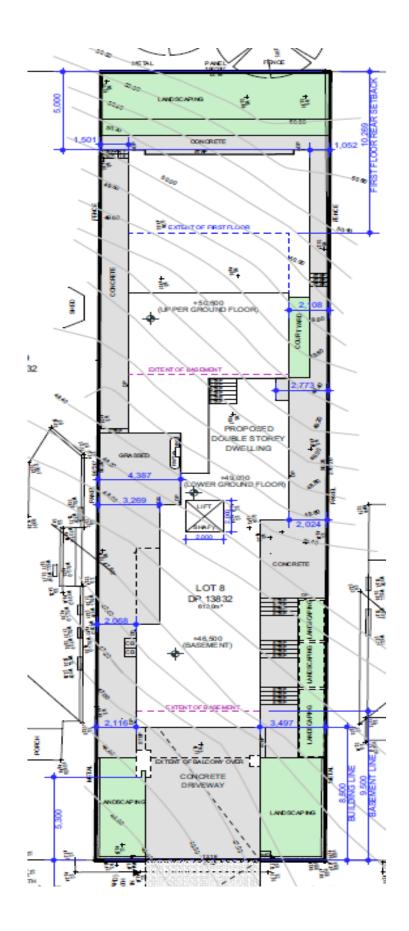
SITE PLAN OF PROPOSED DWELLING HOUSE.
